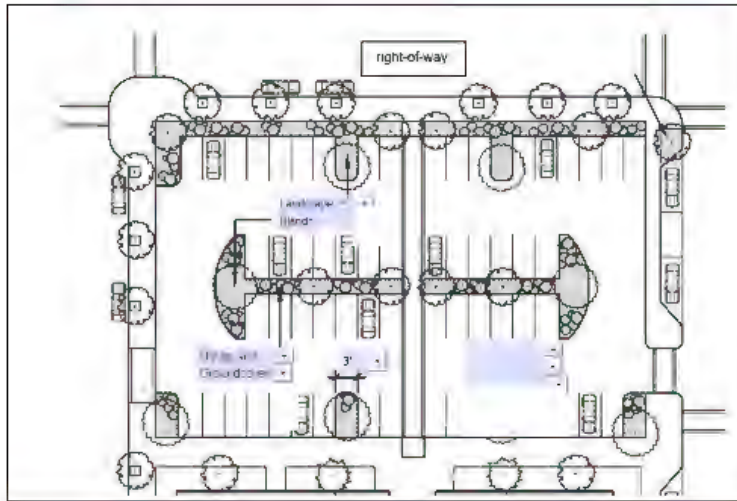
Example Parking Lot Landscape Layout (related to Section 3.120.B)
